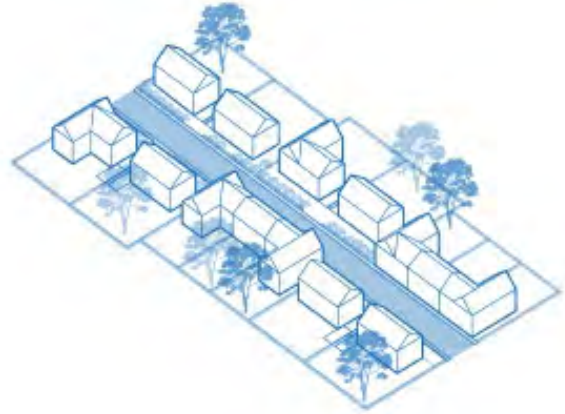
The default building line should be setback from the pavement behind an appropriate boundary.
